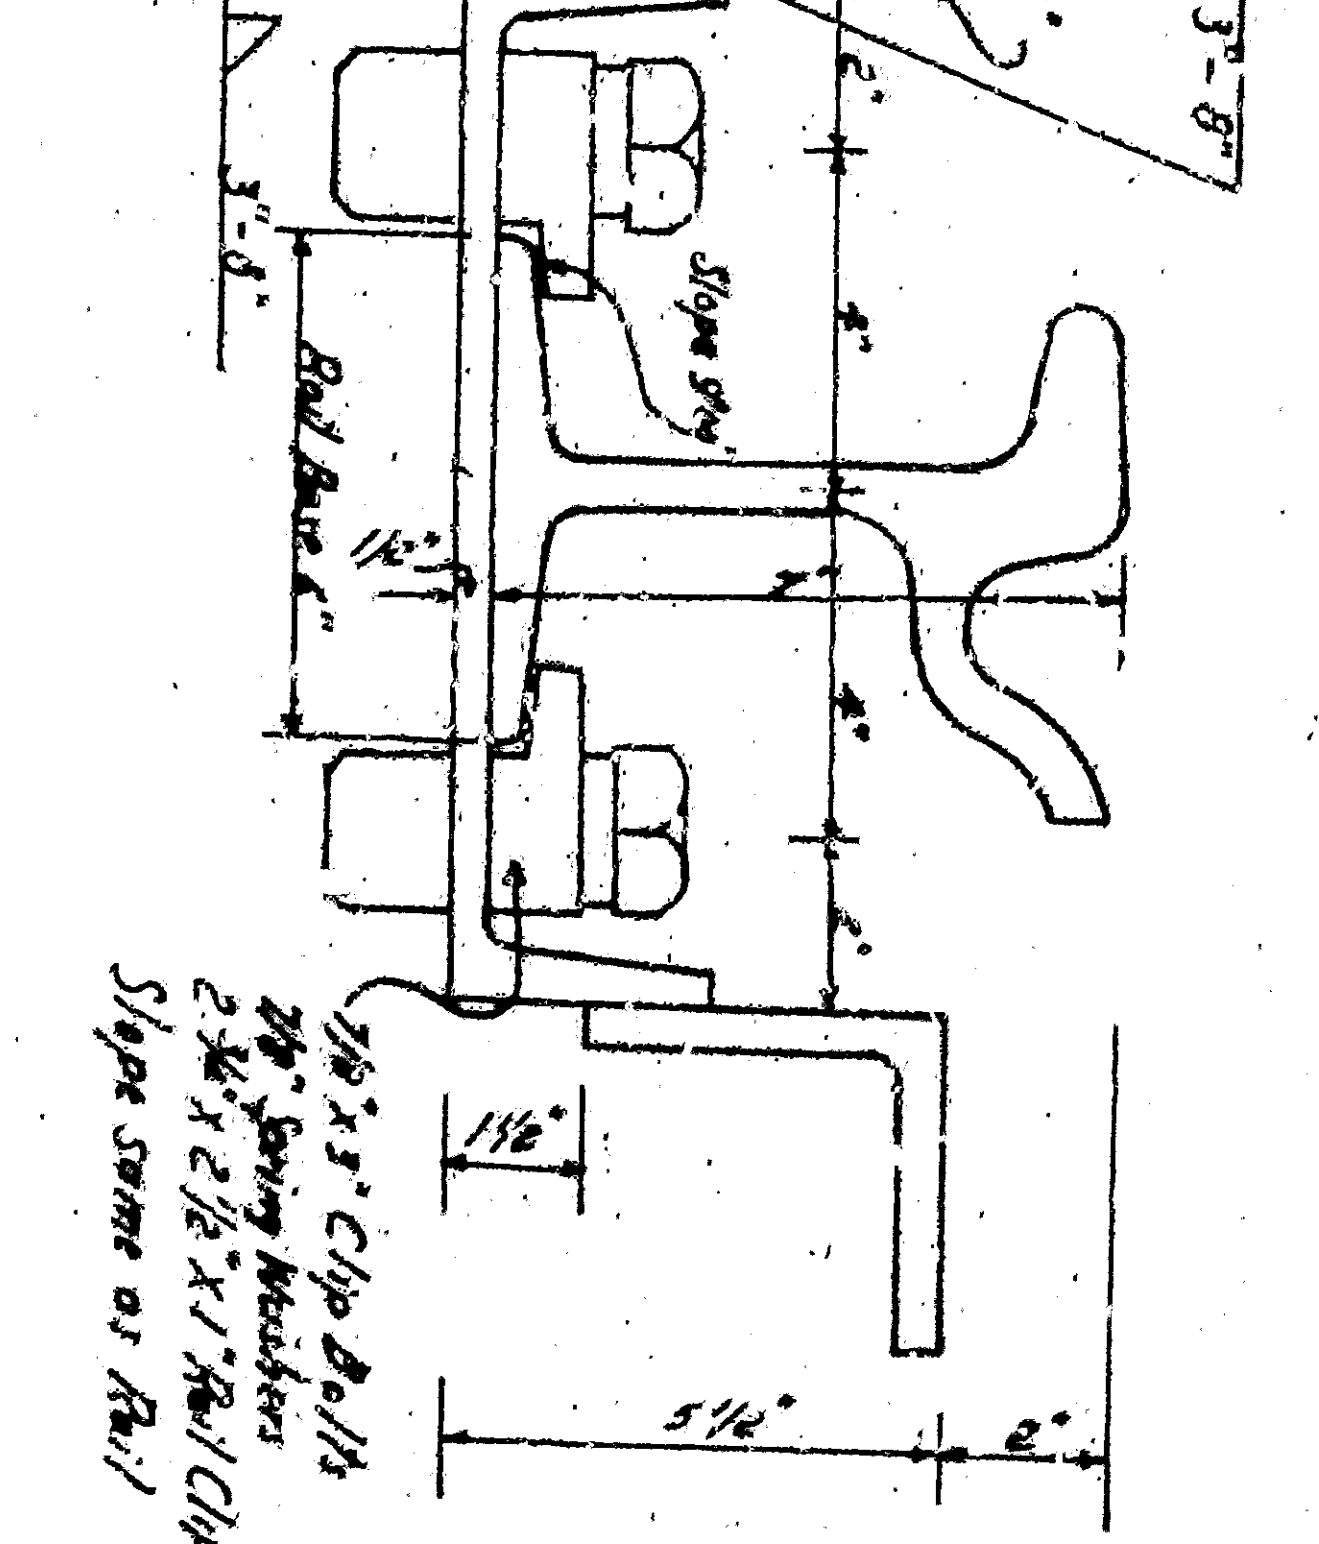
DETAIL - PE RAILWAY CROSSING AT MILL STREET
